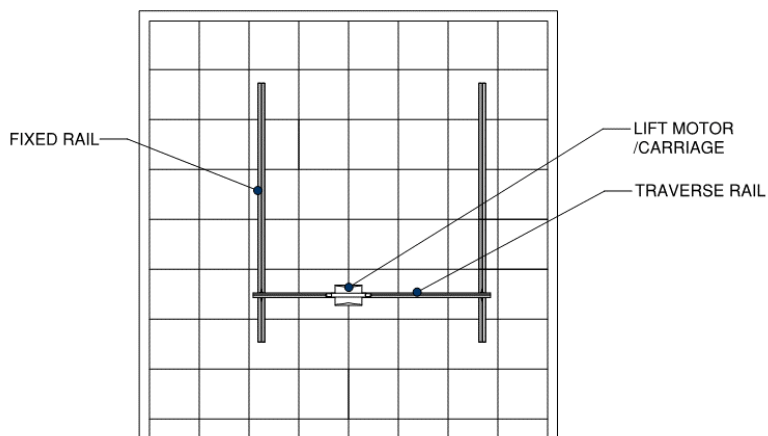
This view represents the ceiling plane and all ceiling elements visible at or immediately below the ceiling plane.
